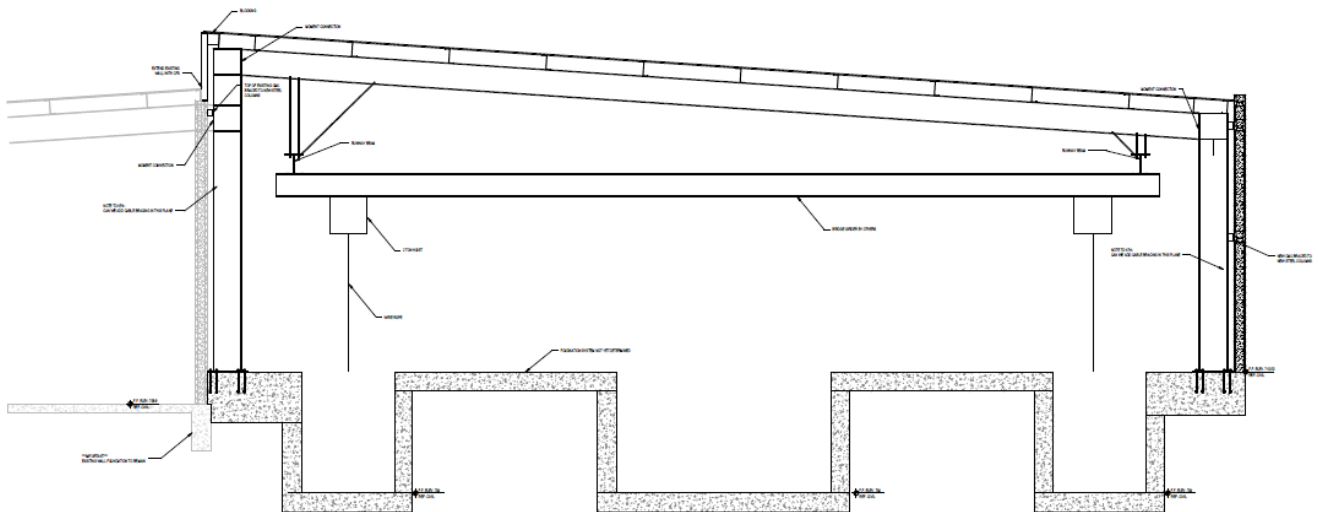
Building Section Sketch from Dudley Dunham (Strictly Preliminary)
